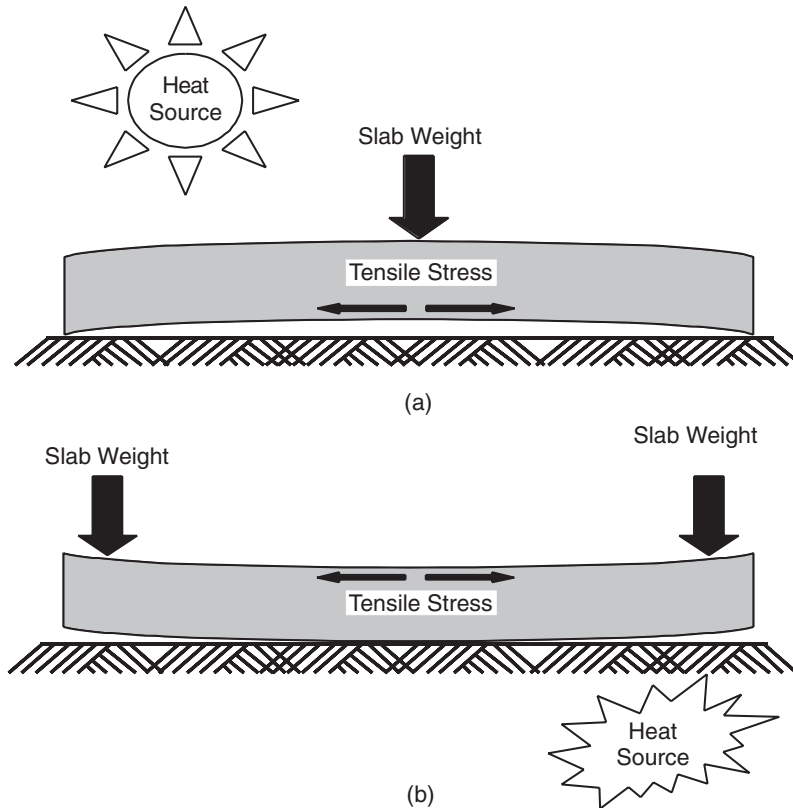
Stresses caused by curling movements of concrete pavement slabs
